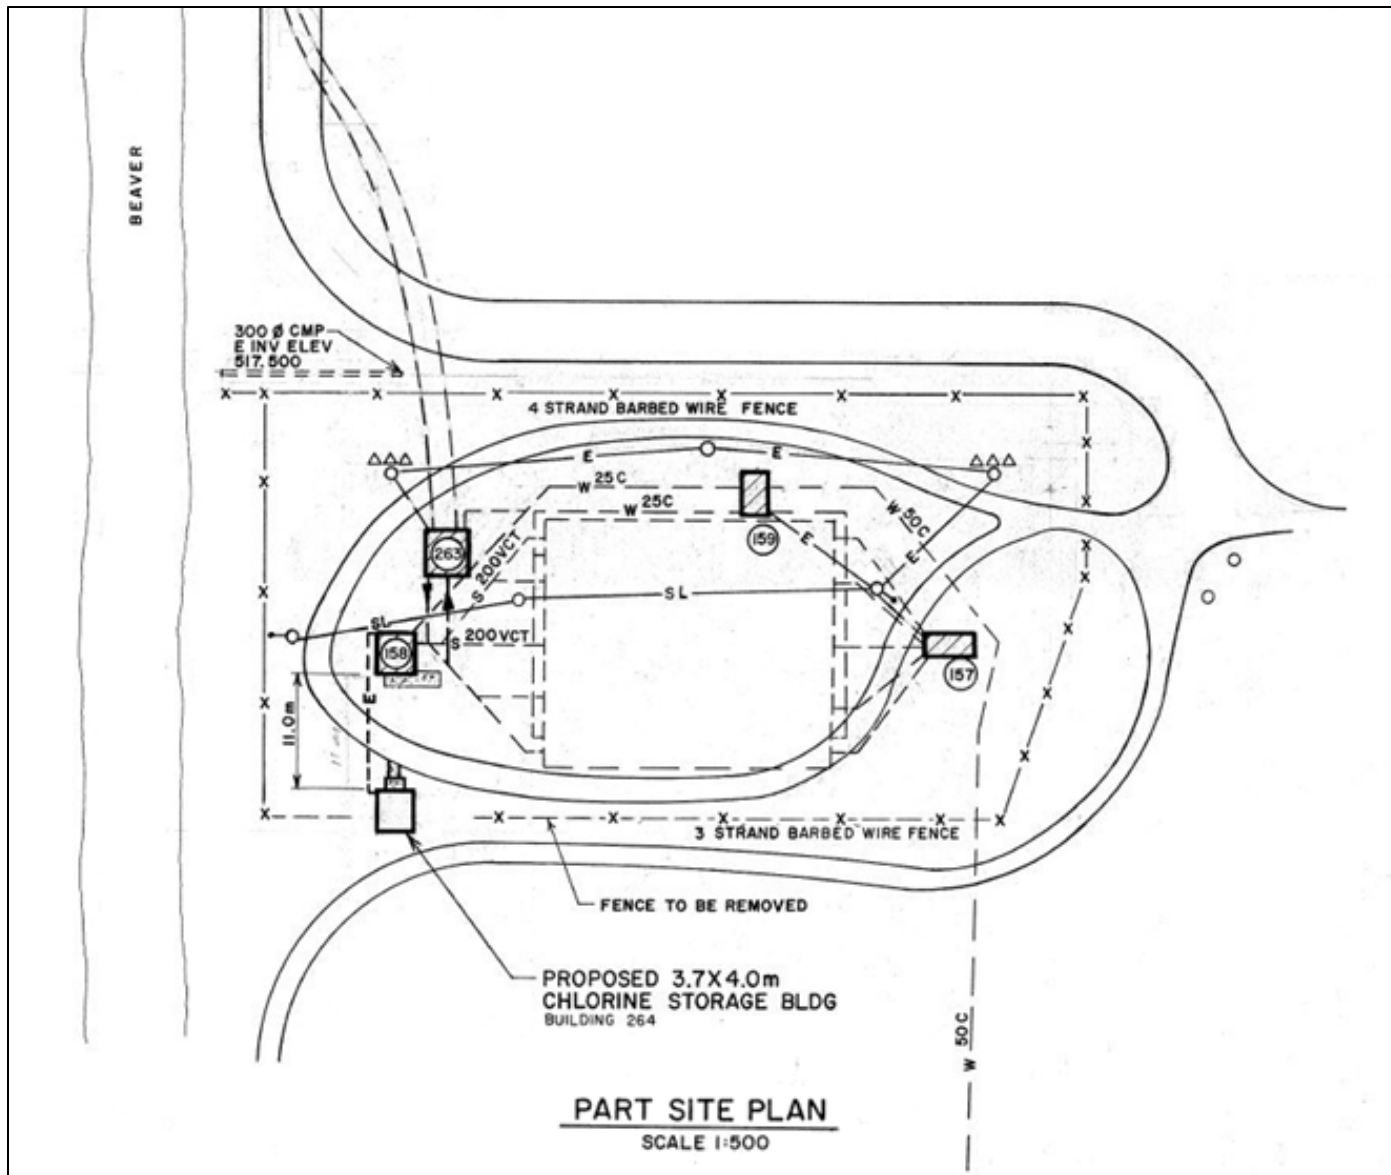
1992 Construction drawing - Site plan of lift station area. Note: Addition of chemical storage shed (Modified from BCEO CFB Moose Jaw 1992)
